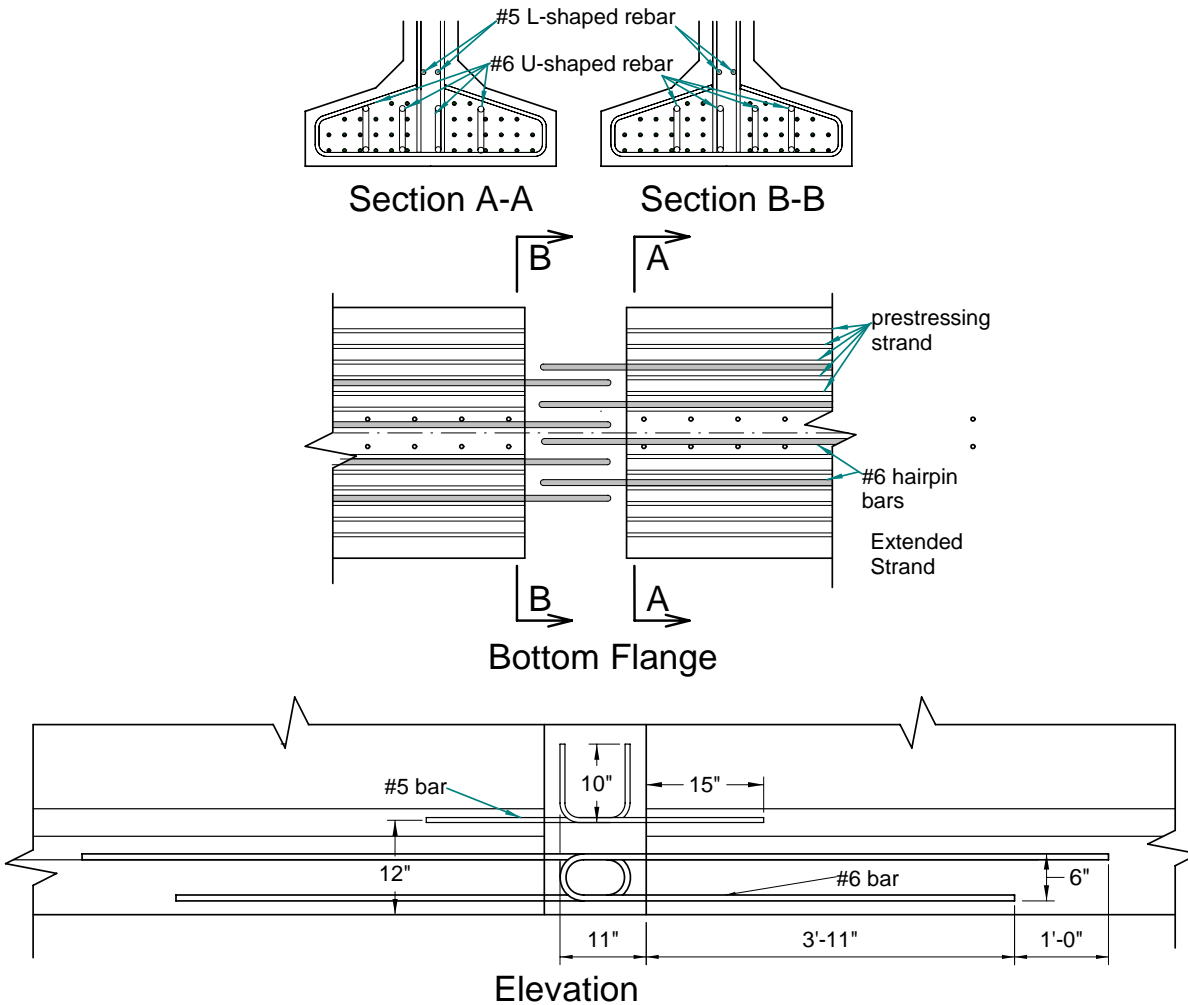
Modified Detail with L-shaped No. 5 Bars High in Bottom Bulb
